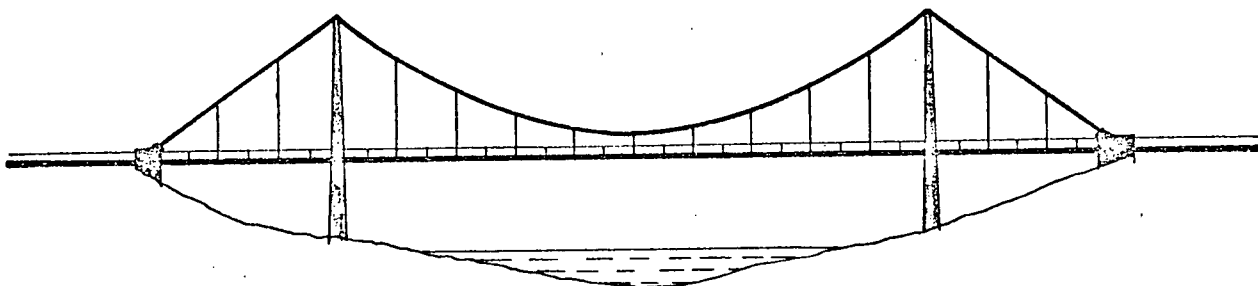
Proper location of the cable to the roadway and guardrail with suspension bridge.
